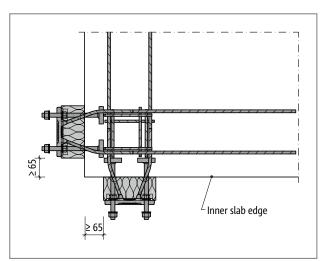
Schöck Isokorb® T type SQ: Edge distances
